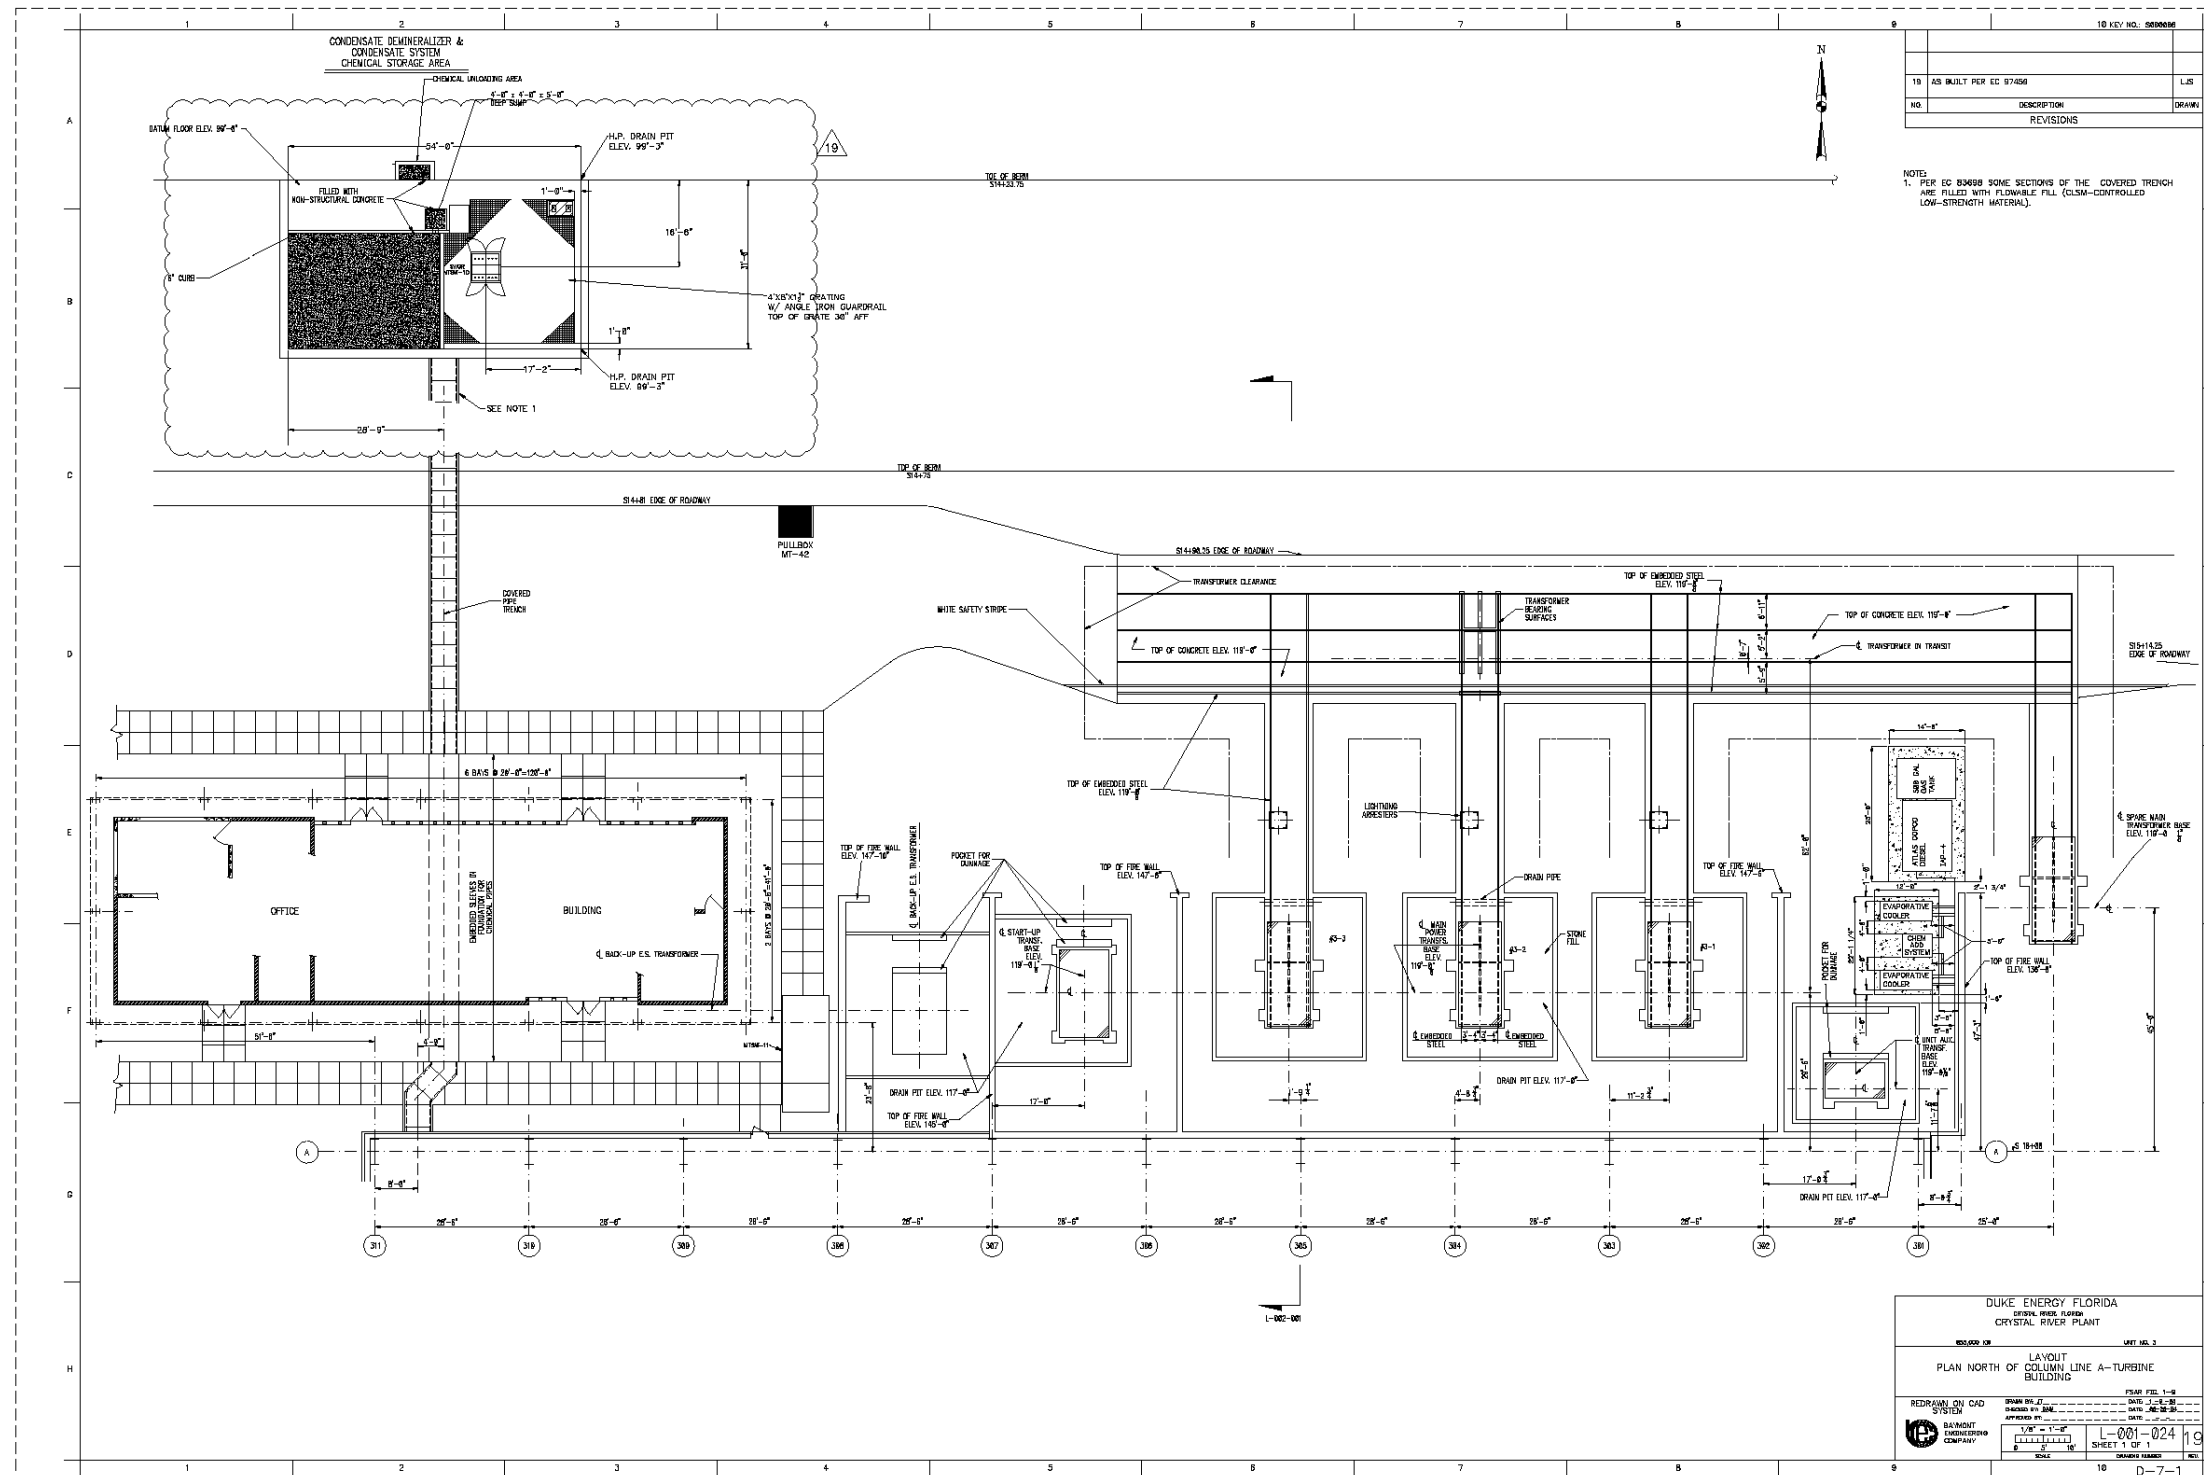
, LAYOUT PLAN NORTH OF COLUMN LINE A, TURBINE BLDG., L-001-024
